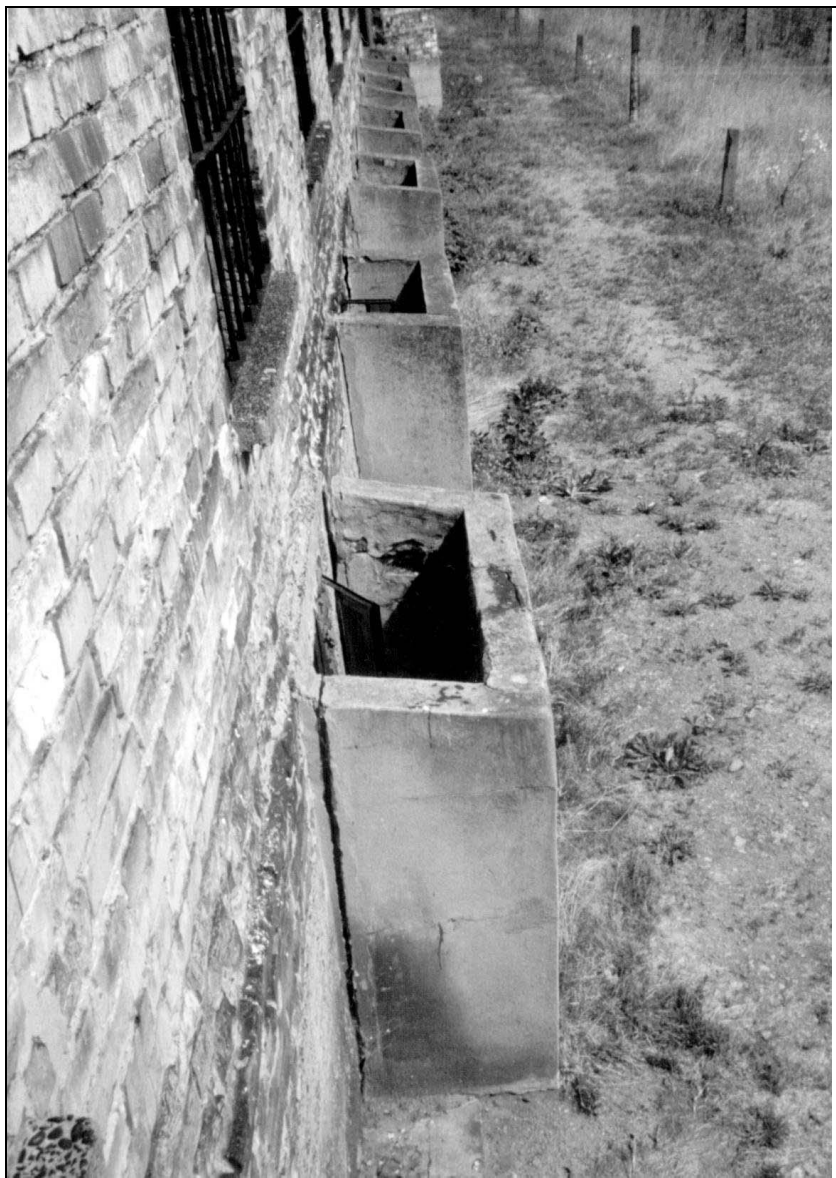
Block 11, wall facing SSW, close-up of concrete screens around the window wells of the bunker cells.
